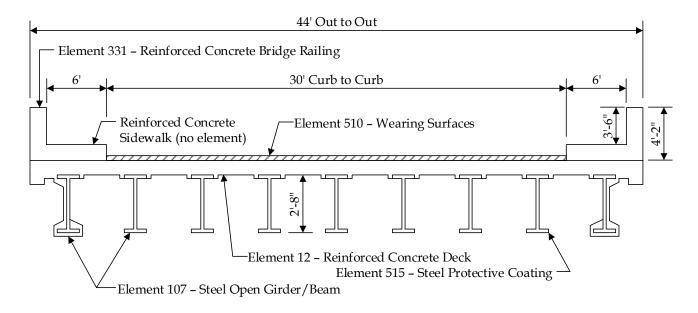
Typical Section of Steel Multi-Beam Bridge
